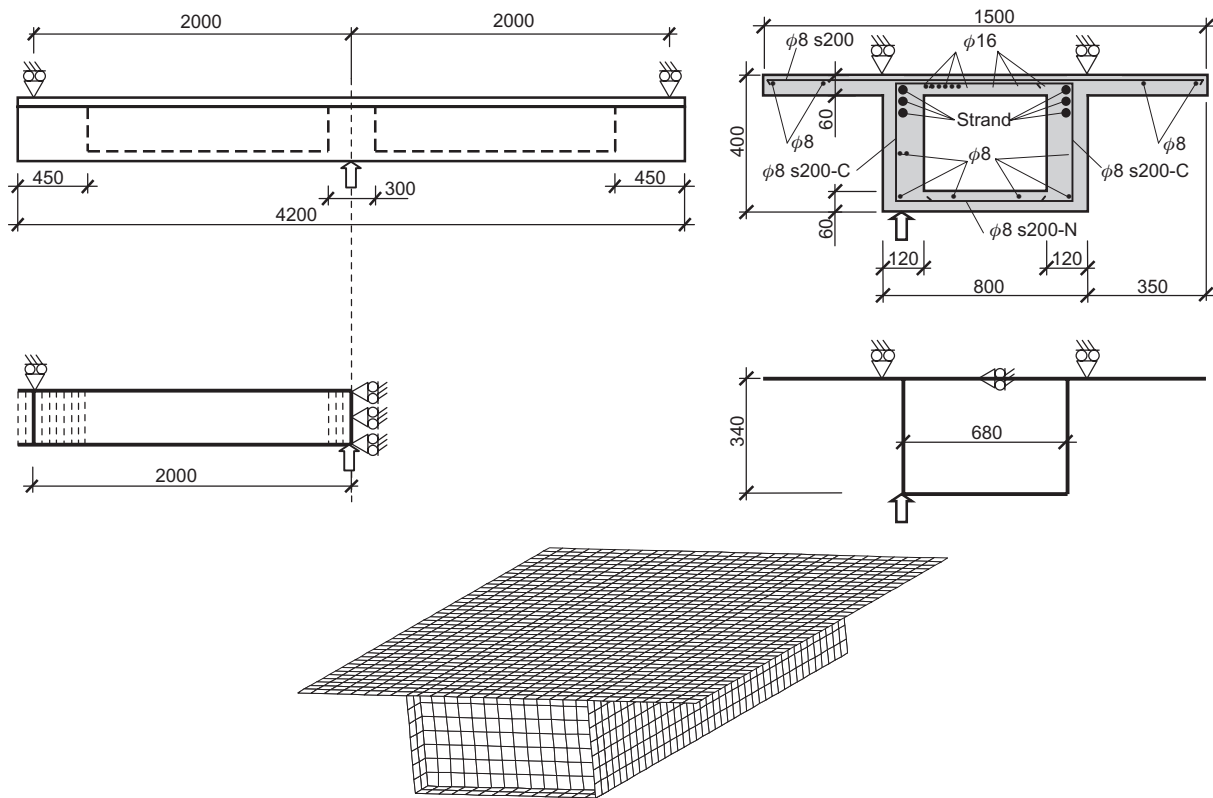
Principal testing arrangement and FE model of the prestressed box-beam, beam 5
